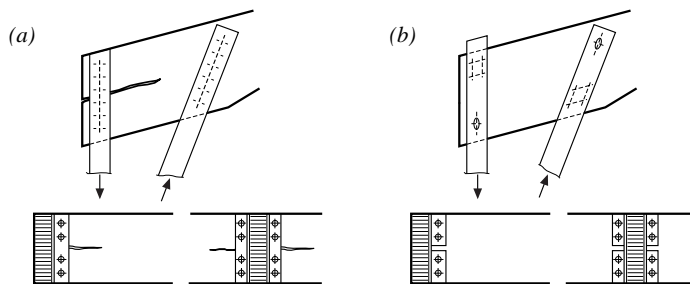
Joint details: (a) Splitting due to shrinkage, (b) correctly executed joint with oval holes.
